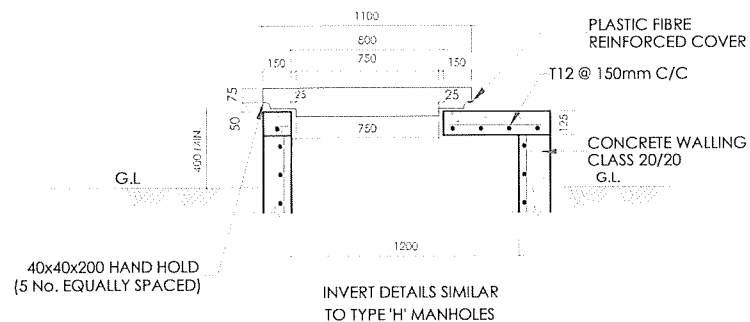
DETAILS OF TRIANGULAR CONCRETE FILLED MANHOLE COVER FOR FOUL SEWER
